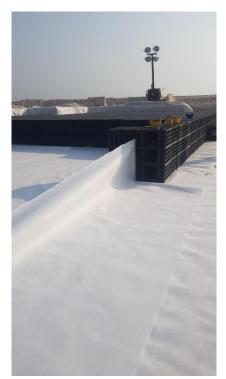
A: Showing Inspection row being installed and being surrounded in its own geotextile casing to prevent debris from spreading into the entire tank Structure.
